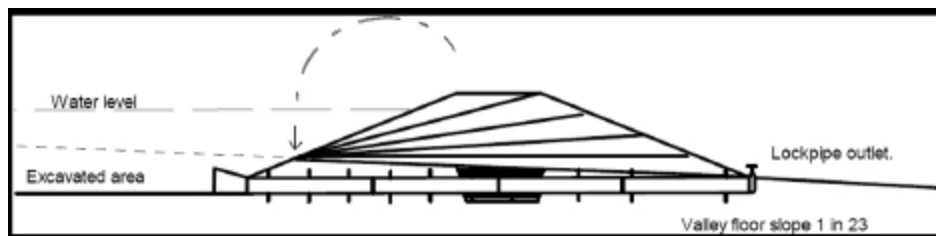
Showing where the explosive charges should be lobbed into the water and where it is intended to explode.
